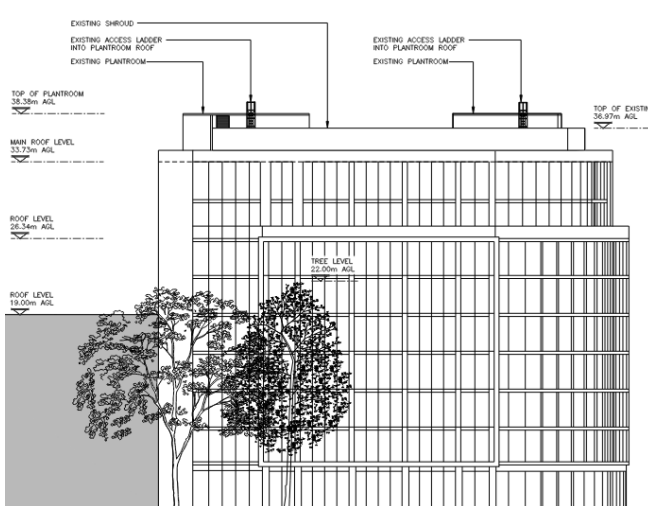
(above): Existing north east elevation (source: Existing drawings)
